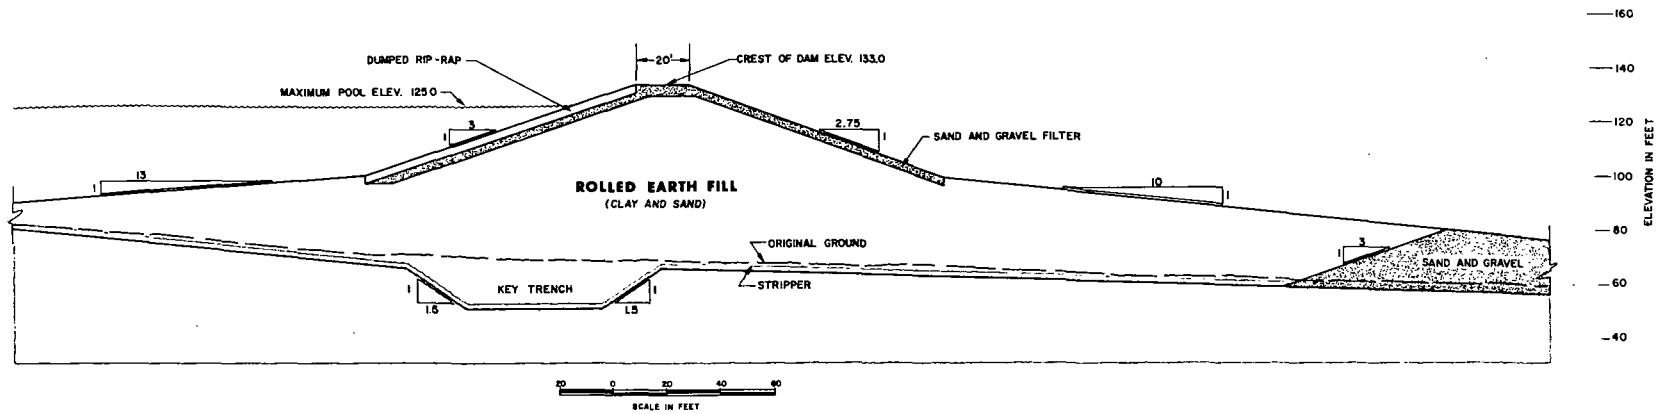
ARENA DAM TYPICAL PROPOSED SECTION
